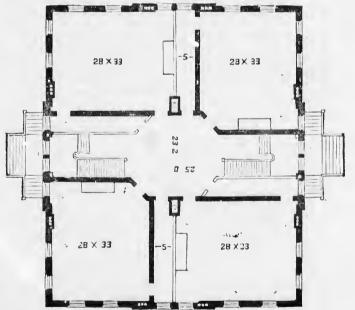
PPAN OF GROUND PLAN, ADAPTED TO FIG. 160.
